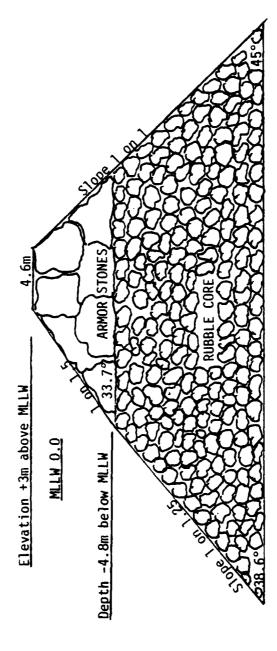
Cross-sectional view of the 122 meter extension of the Monterey breakwater showing design features
